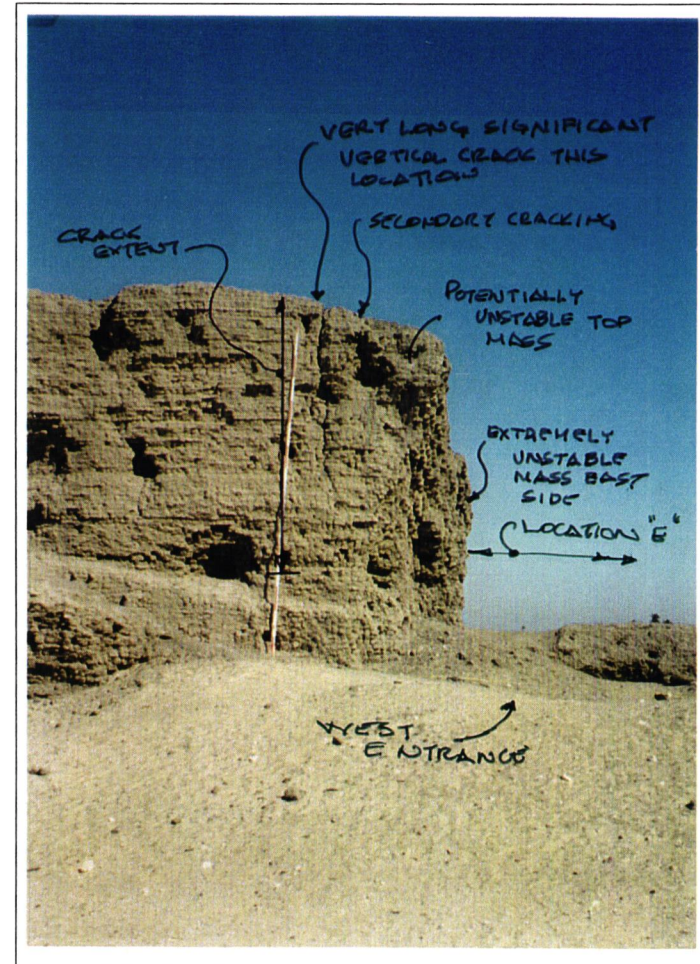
Wall Undercutting West Main Enclosure Wall
